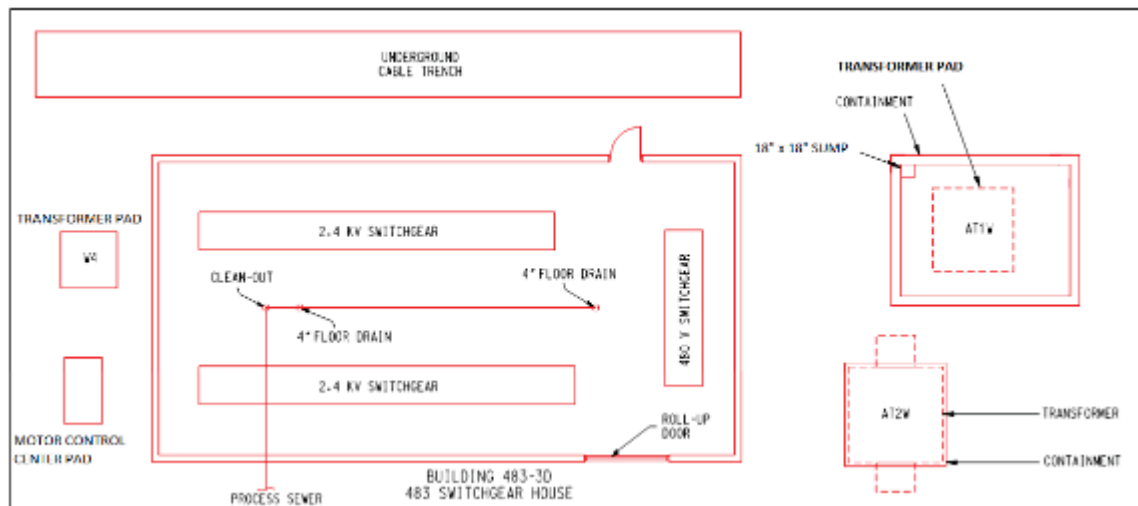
Building 483-3D, D-Area Electrical Control Building Original Layout (The only equipment left to be removed is AT2W, outside the scope of this SOW)
